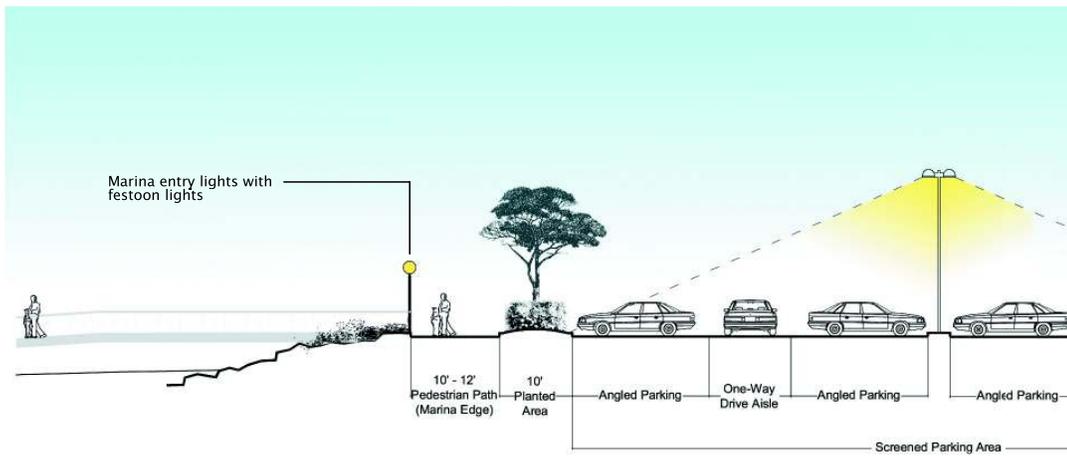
Marina Access - prototypical cross section at Mulford Point Drive, looking west
